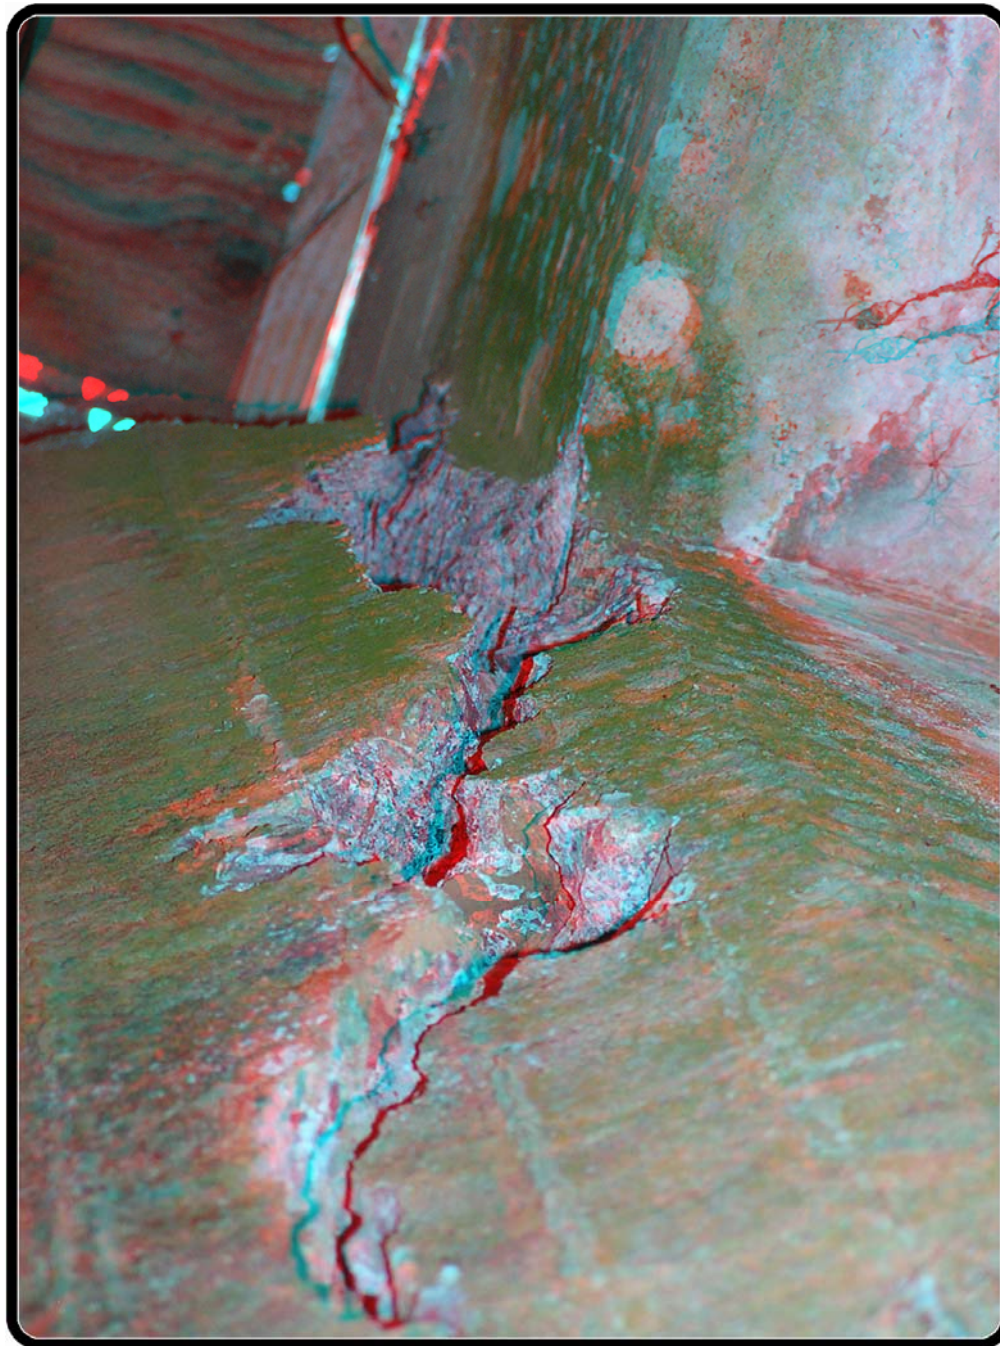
Location 20. Bridge at MP 28, Hwy 270. Looking upward at spalled structure.
